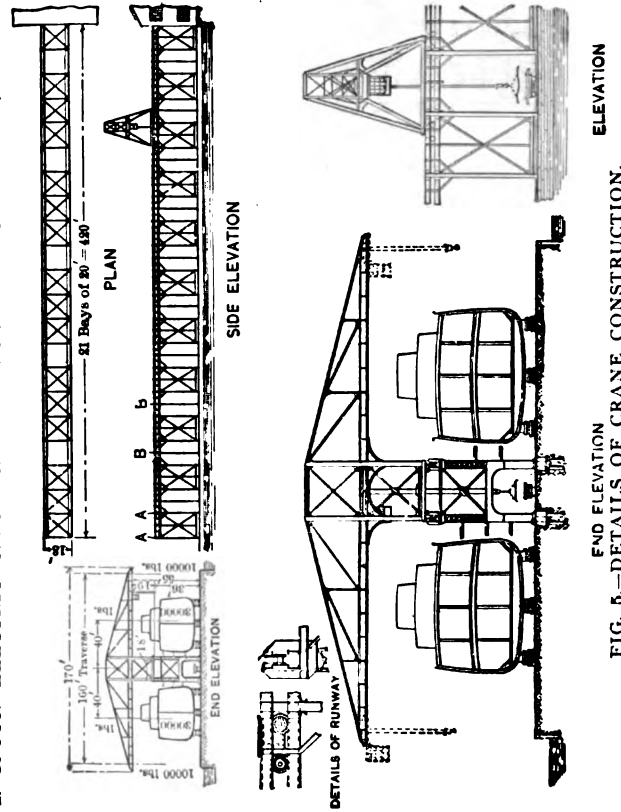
DETAILS OF CRANE CONSTRUCTION.
